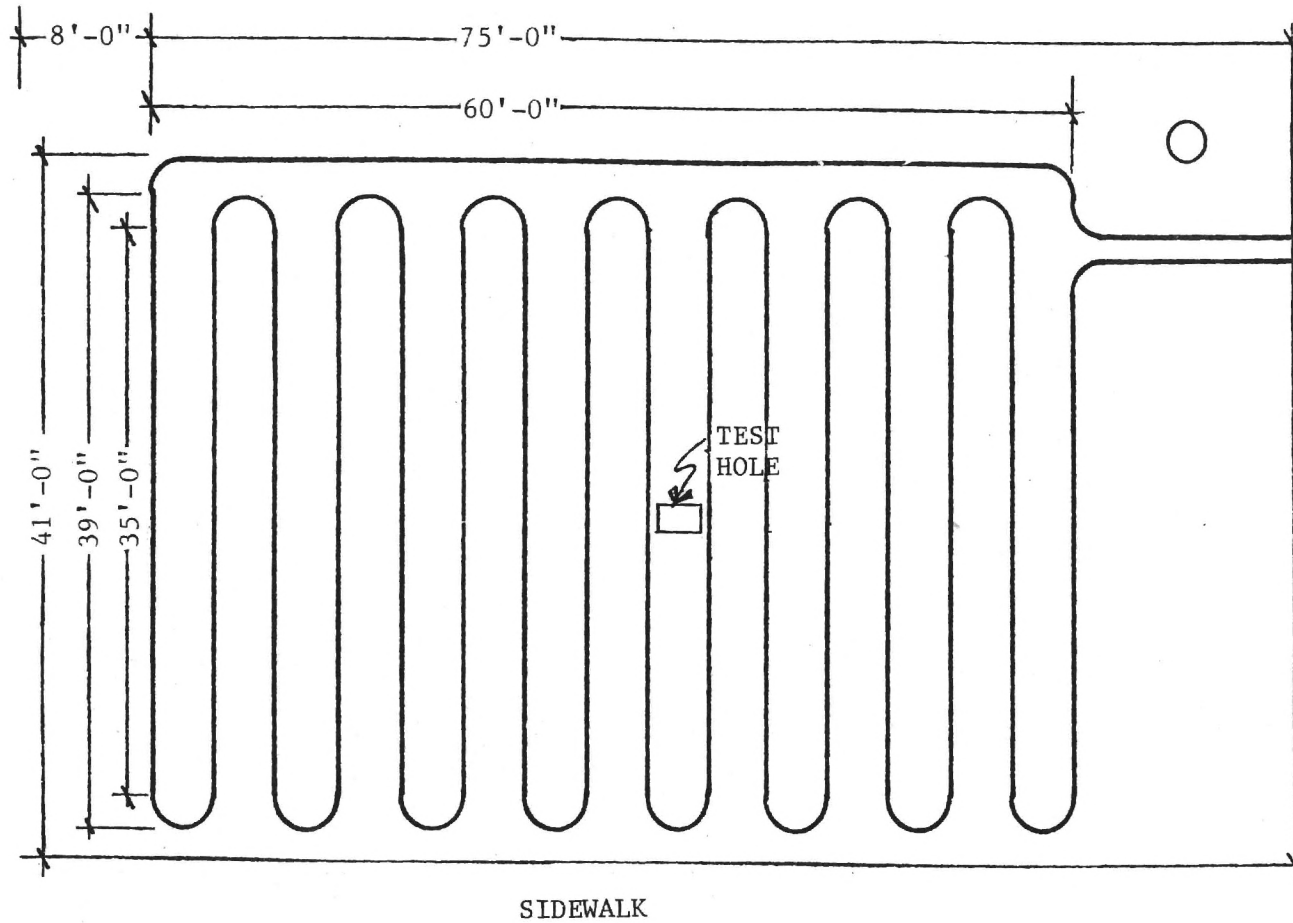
PROPOSED PIPE FIELD LAYOUT
